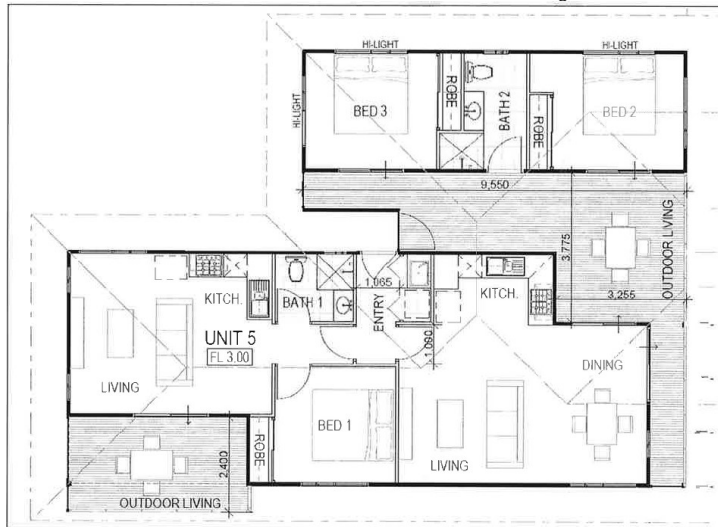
An example of a layout which has common laundry facilities but the form and function is two separate dwelling units. This would be classed as, two grouped dwellings, single house with ancillary dwelling, or multiple dwelling if they were constructed above or below another dwelling.
